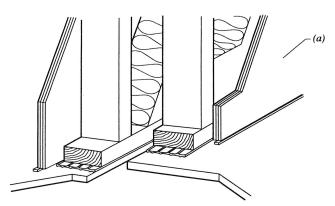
Wall with high sound performance, designed as two individual wall units separated by a cavity. Each wall unit has plasterboard linings on its sides and is filled with insulation between the wall studs. (a) Gypsum plasterboard.
